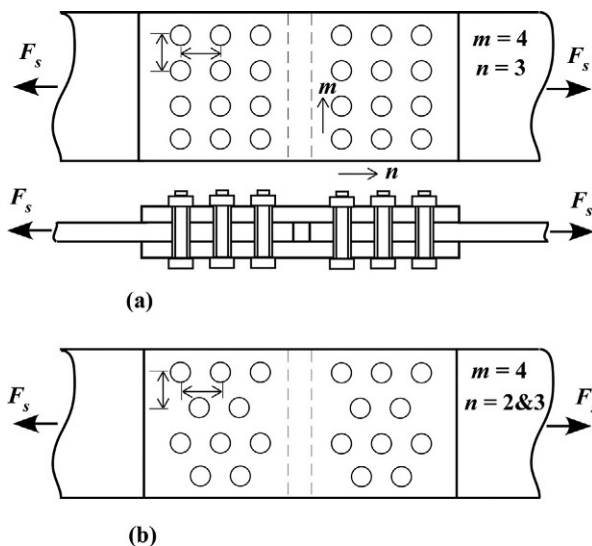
(A) Chain type bolted joint and (B) zigzag type bolted joint.
